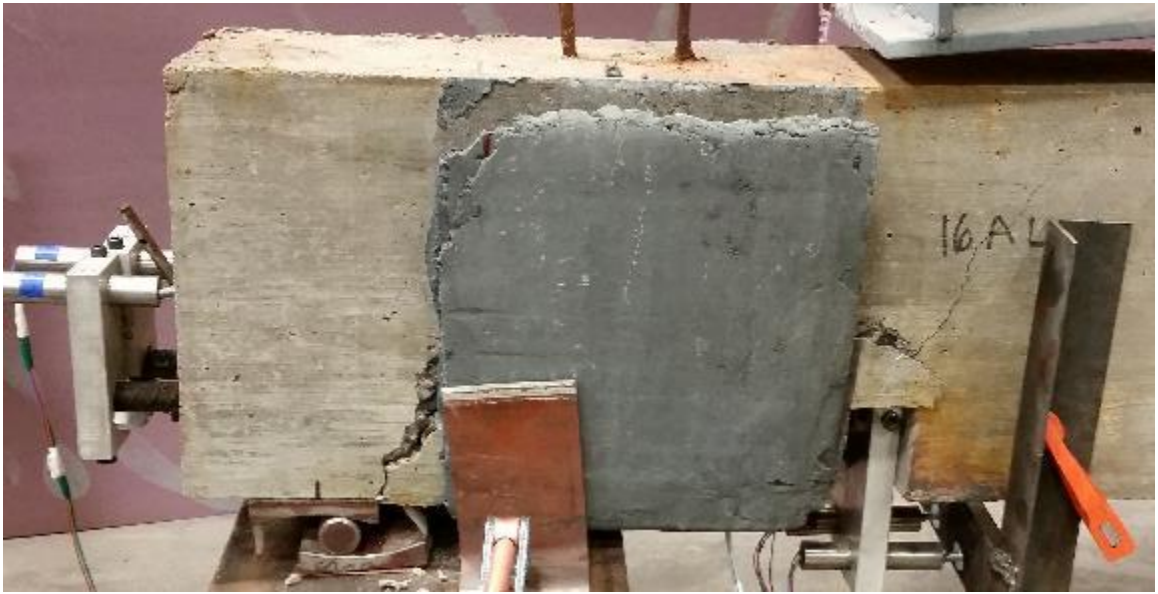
Failure at left support of Beam H-R1-F-7 (Side A)
